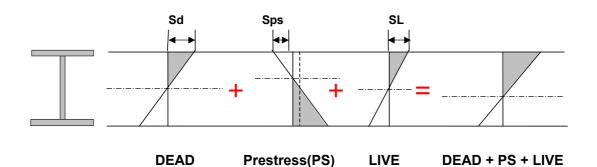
Design Flow for Steel I Beam Bridge Reinforced by External Cable Addition
